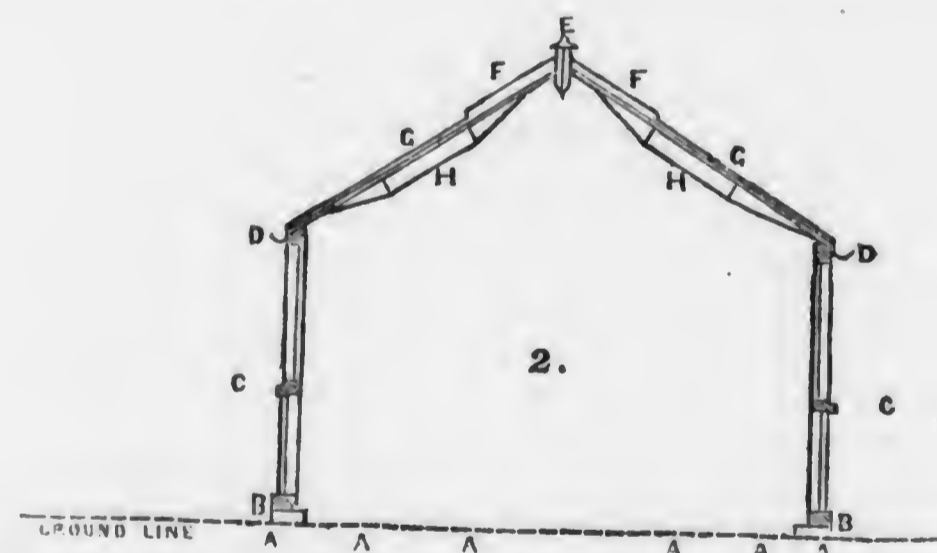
Section of Portable Greenhouse, without rafters, on the Truss Principle.
